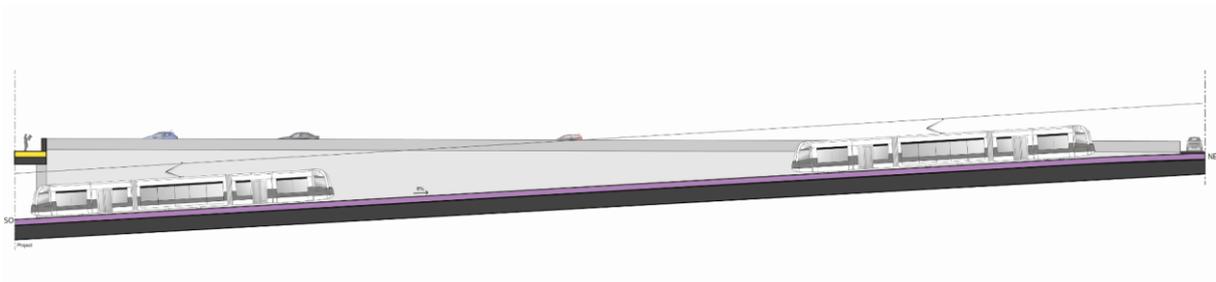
tramway in tunnel option - longitudinal section on the ramp in Liivalaia Street - Egis
